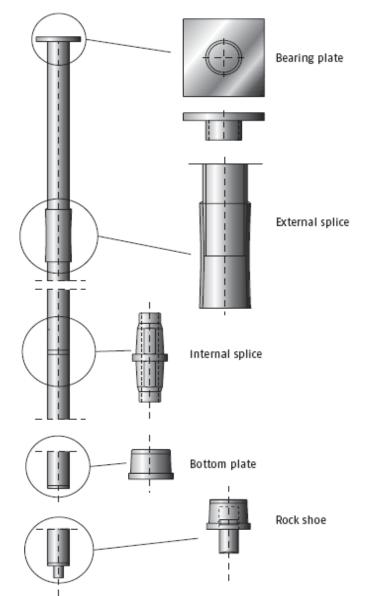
Structure of RR-pile sizes RR75 - RR220
